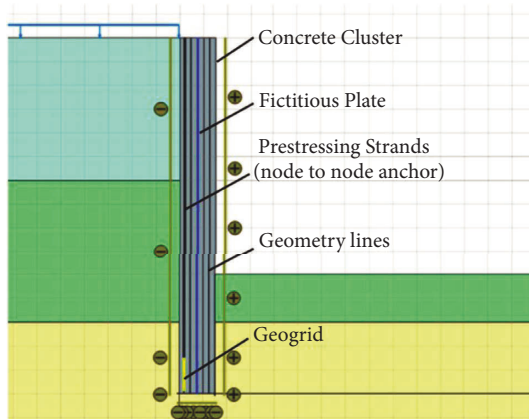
Modeling of prestressed concrete piles in PLAXIS 2D.
